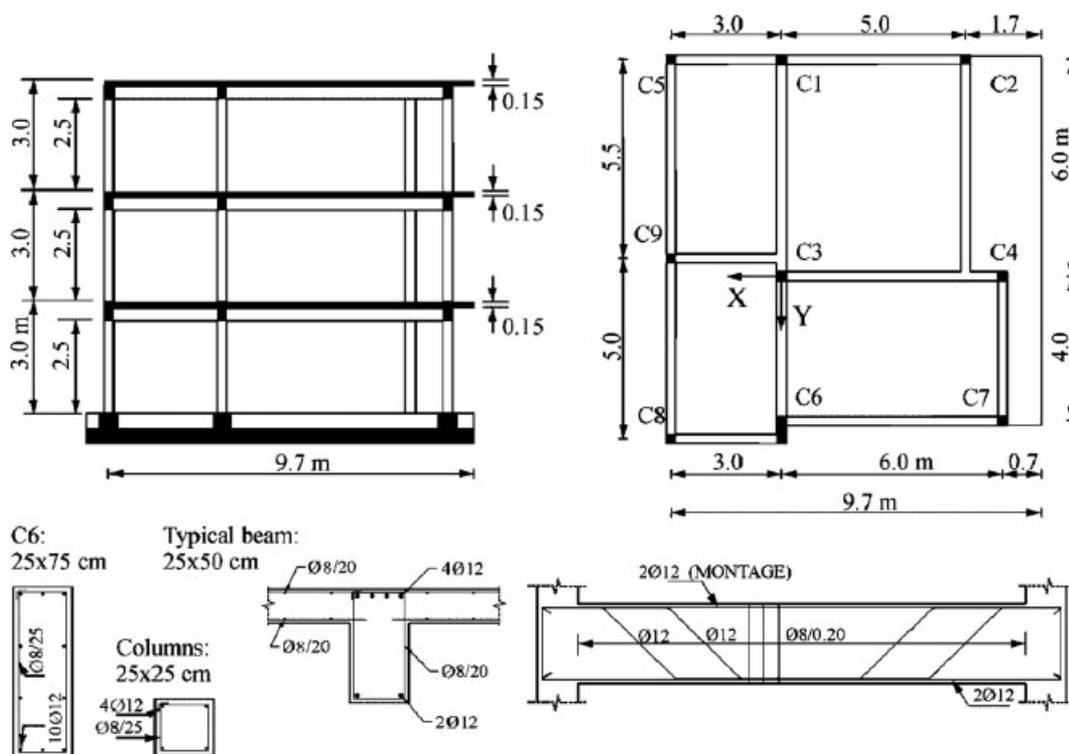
The elevation (upper left) and plan (upper right) view of the test structure, showing typical reinforcement details (bottom).
